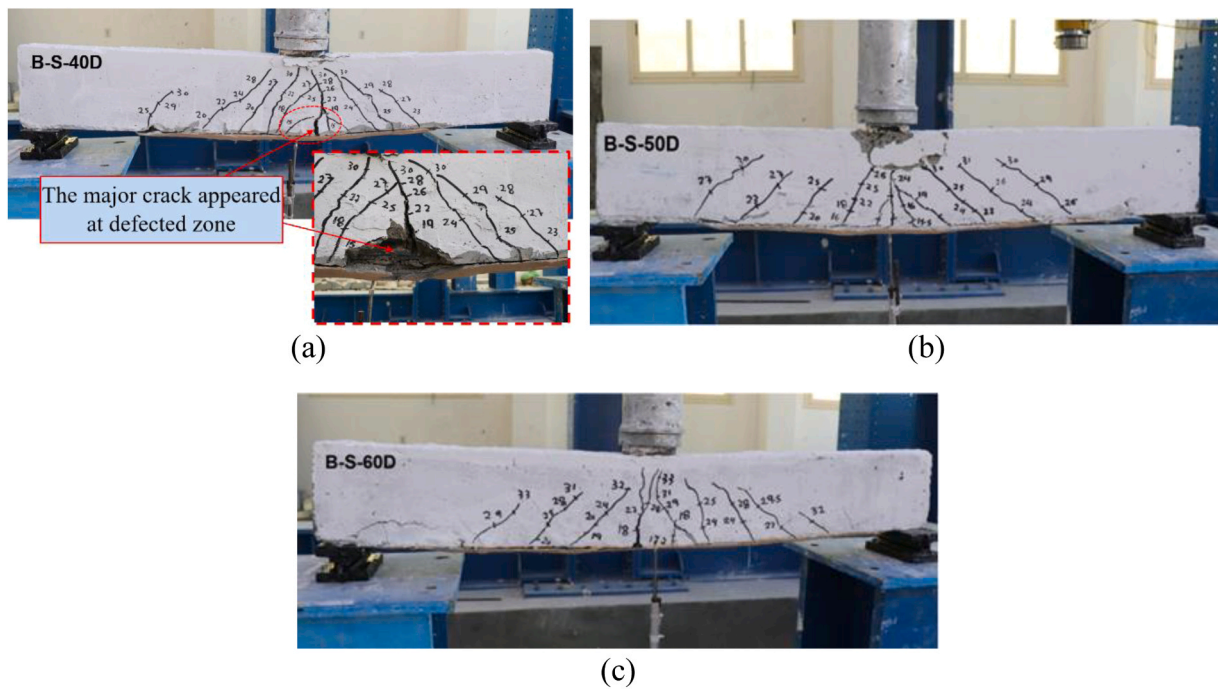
Failure modes of (a) Beam B-S-40D, (b) Beam B-S-50D, and (c) Beam B-S-60D.
